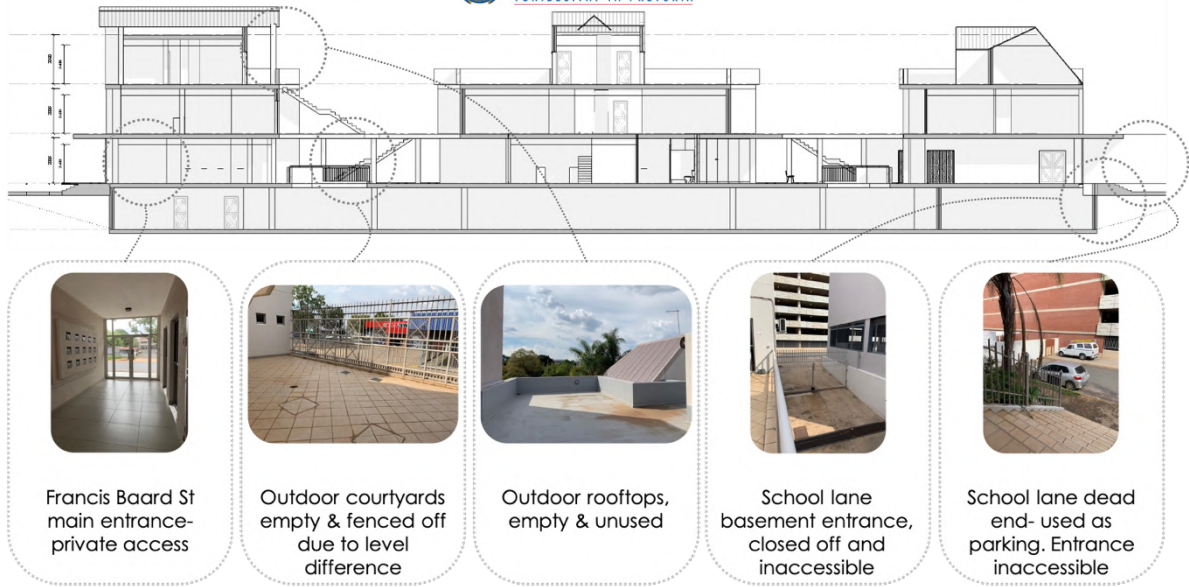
Images illustrating vacant and inaccessible site (Author, 2021).
